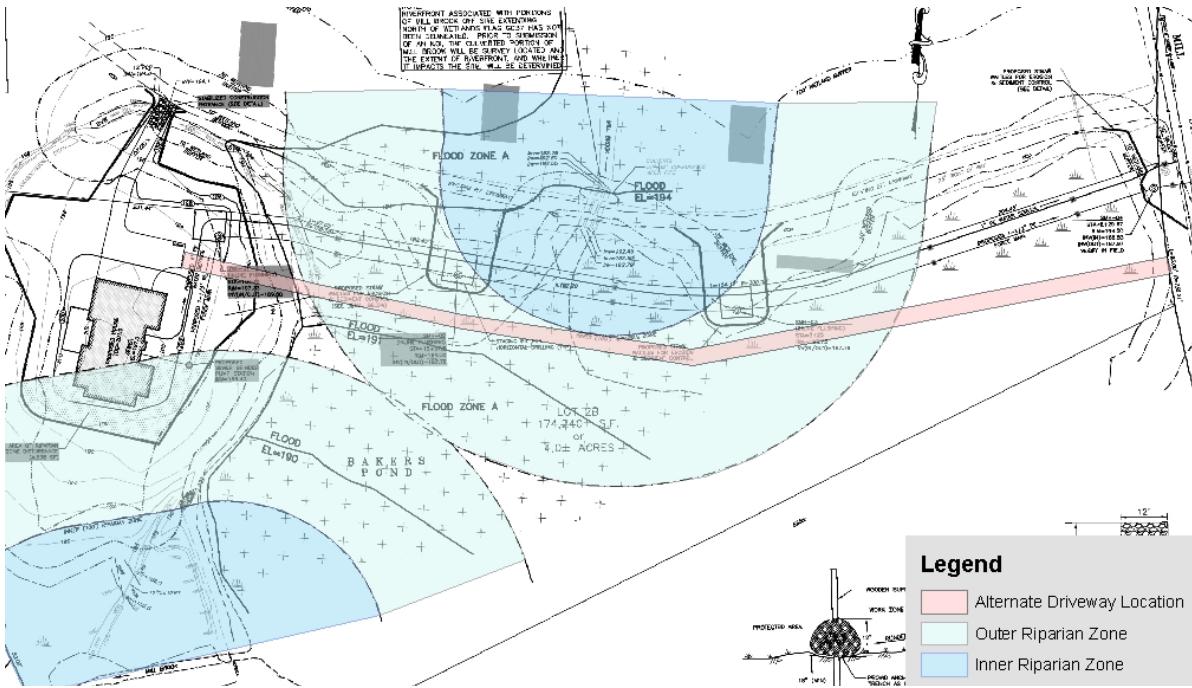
Impacts to Riverfront Area associated with the alternative construction of a new driveway.
